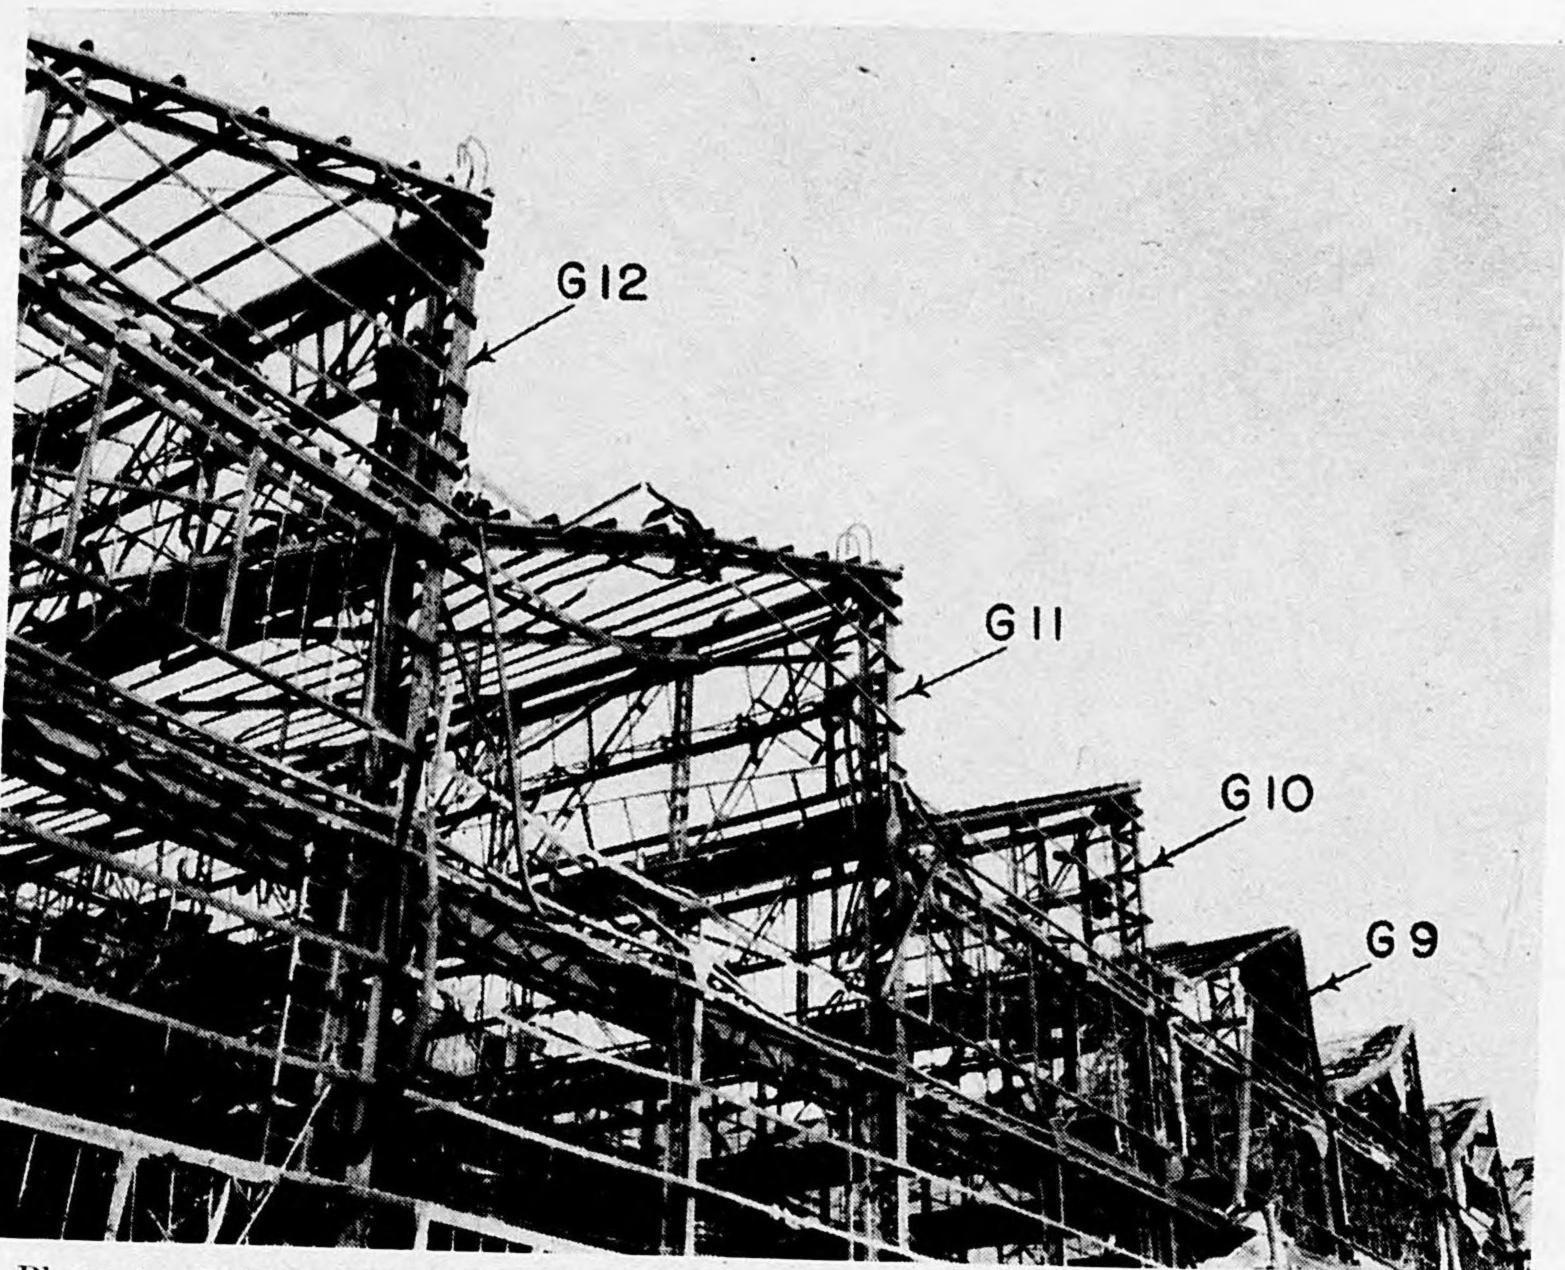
Building 301a, Bomb 30; damage between Columns G12 and G11 looking NE.
